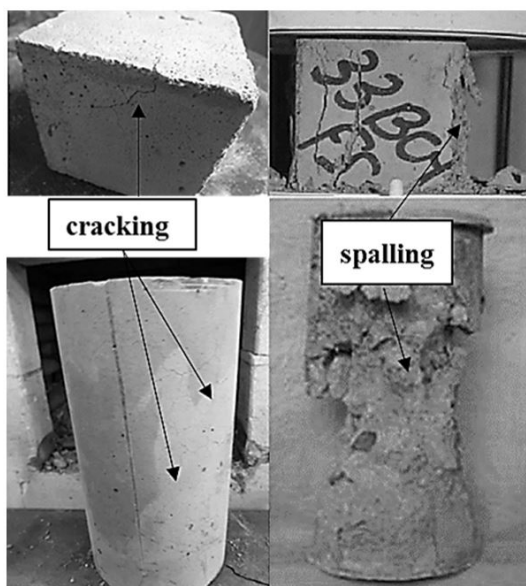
Explosive spalling and cracking of concrete specimens after heating.
